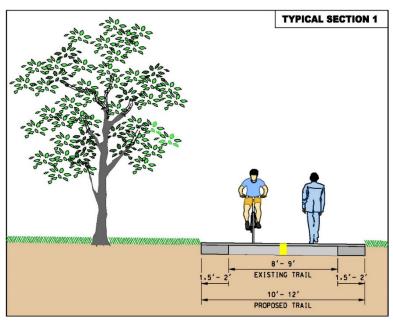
Typical Section of Trail Widening Distributed Evenly from the Centerline
